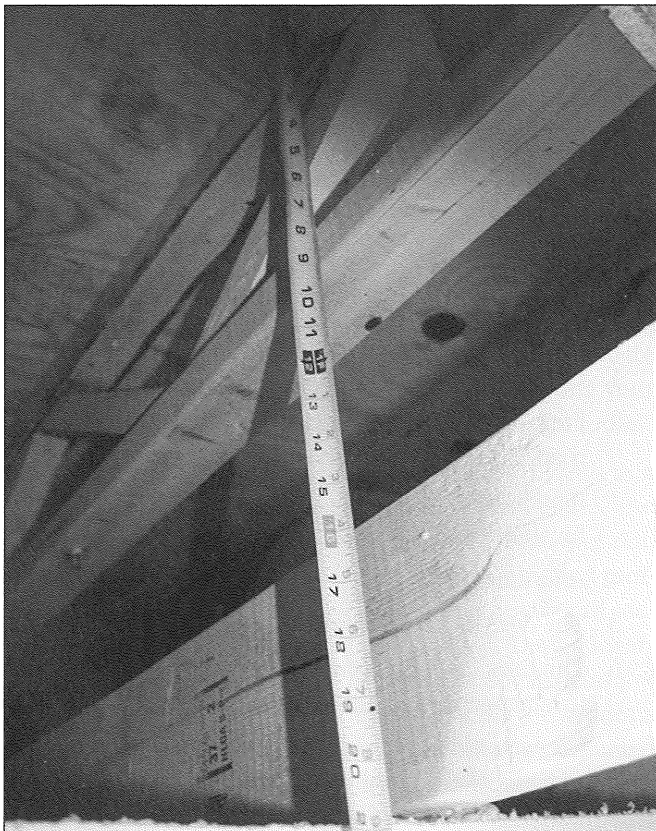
Void space from the first-floor ceiling up to the second-floor subfloor. Courtesy of Kevin Gallagher.
